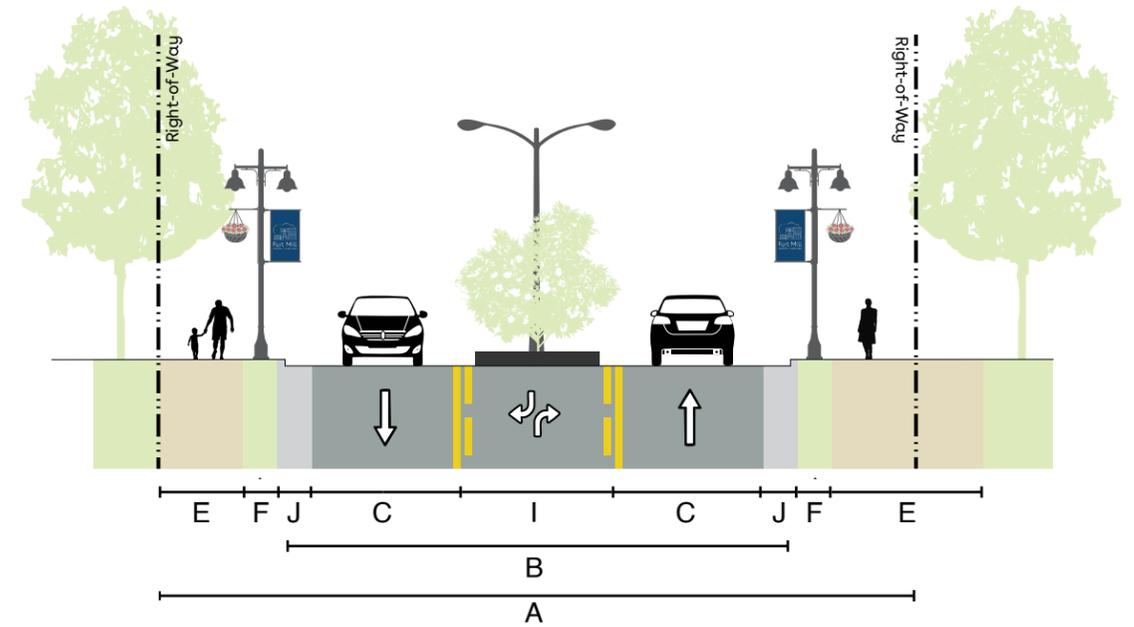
Boulevard - B Section, 55' ROW Shown
